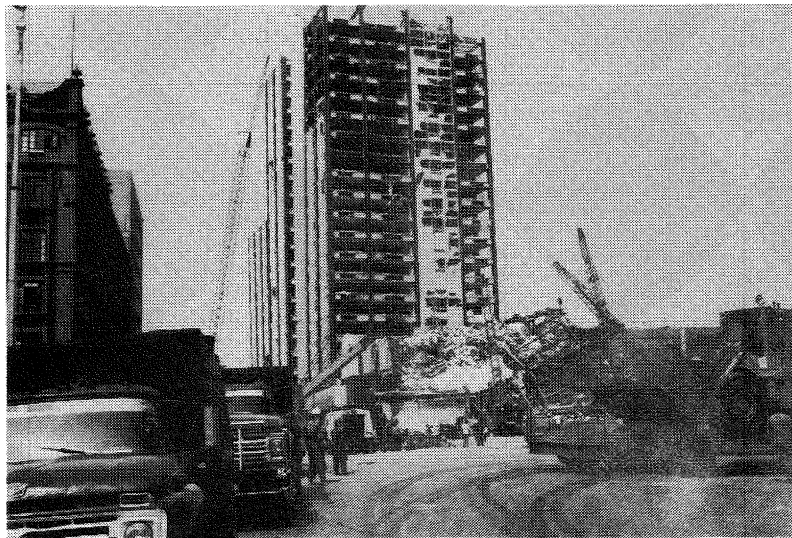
Pino Suarez Towers during clean-up operations. In foreground, debris from 20 storey tower which collapsed over adjacent 14 storey building.
